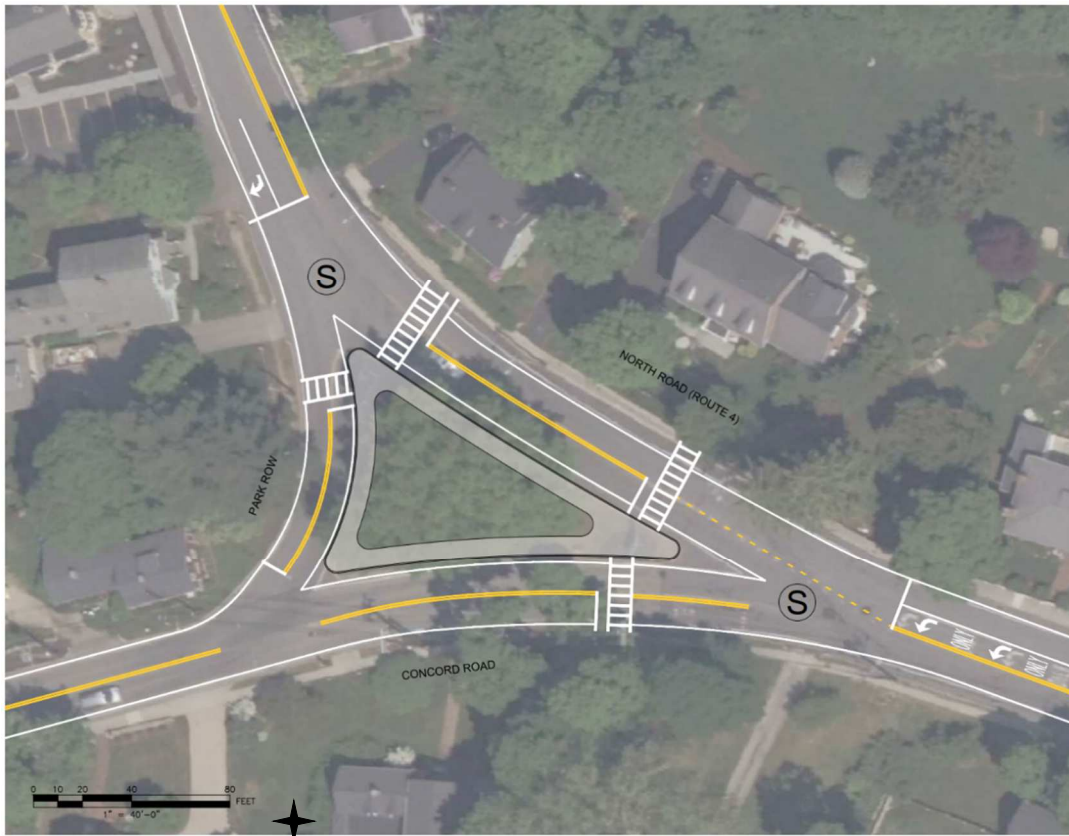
Willson Park Recommendations from the *Great Road Streetscape Master Plan
